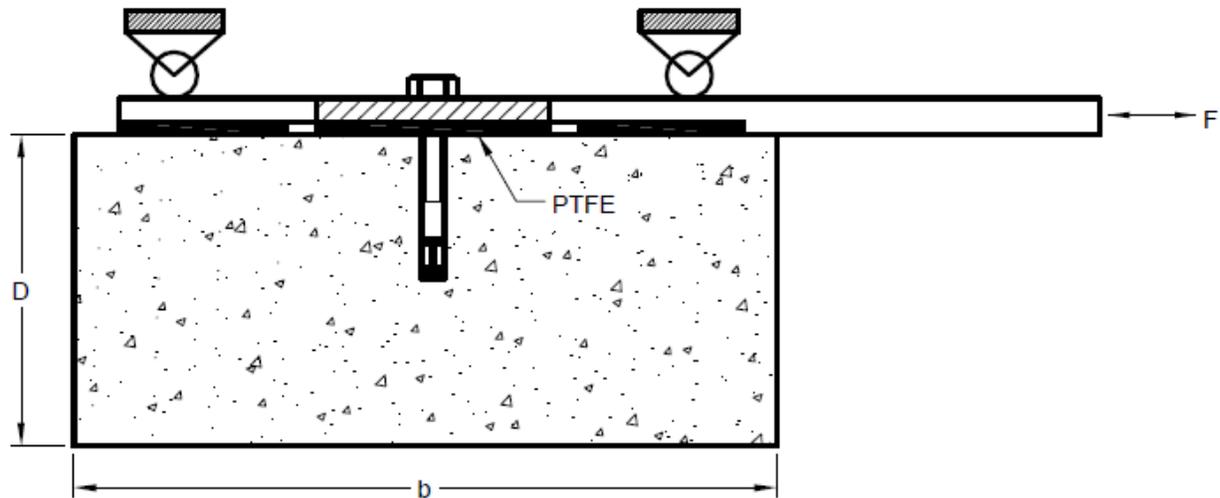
TYPICAL ALTERNATING SHEAR TEST SETUP
